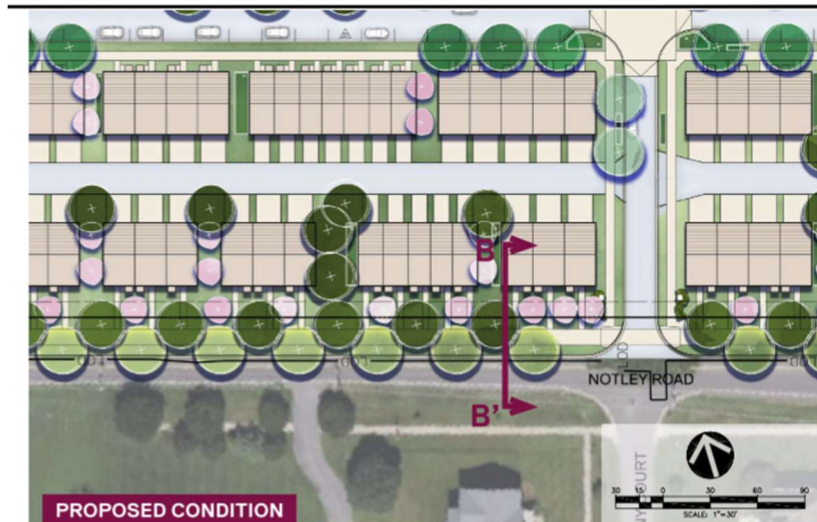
(excerpted from DAIC Notley Road Landscape Section)
